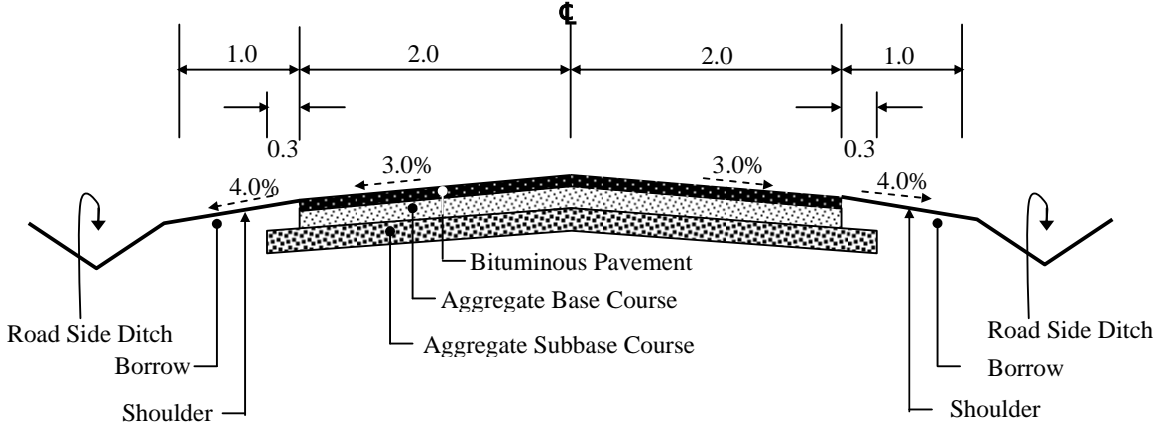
Typical-Cross-Section of Two-Lane Bituminous Road
